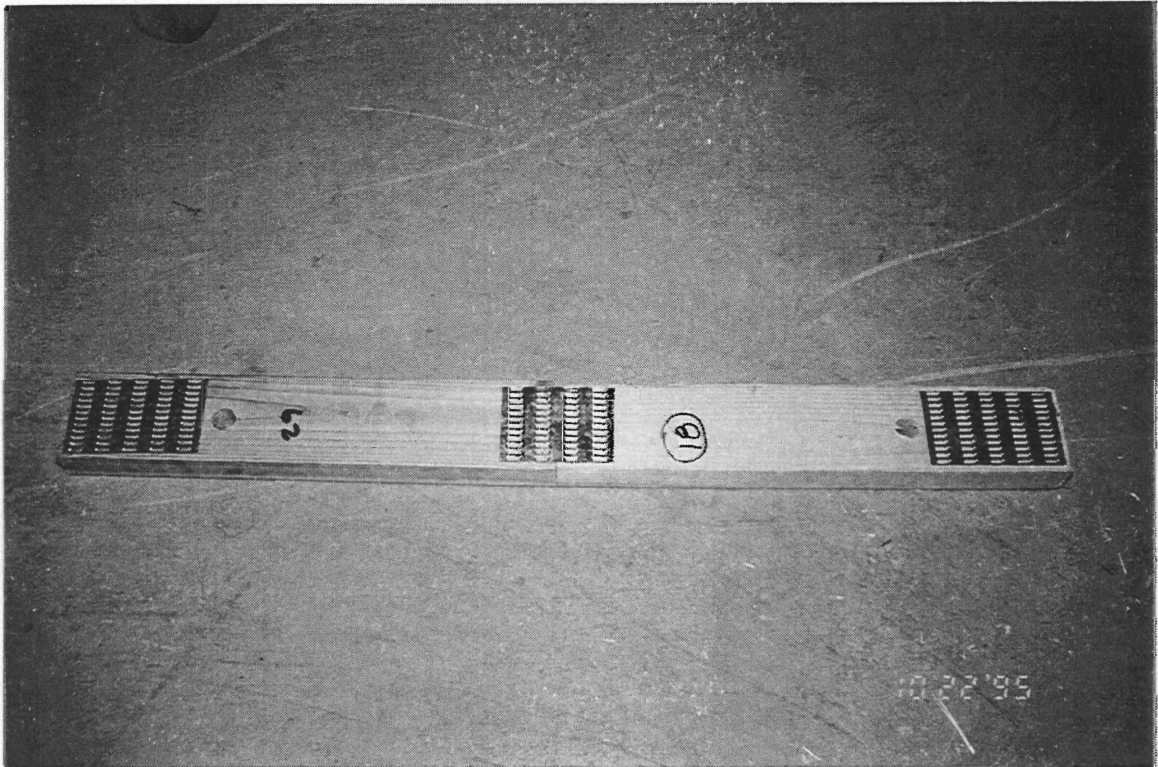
Photograph of a typical test joint used in the tension-splice study.
